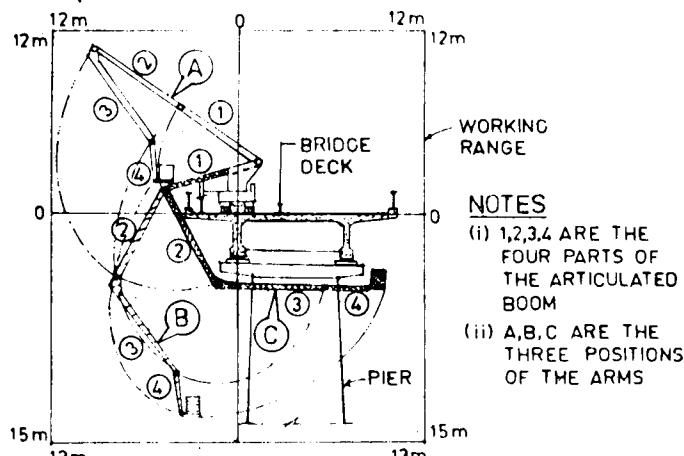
MOBILE BRIDGE INSPECTION UNIT
